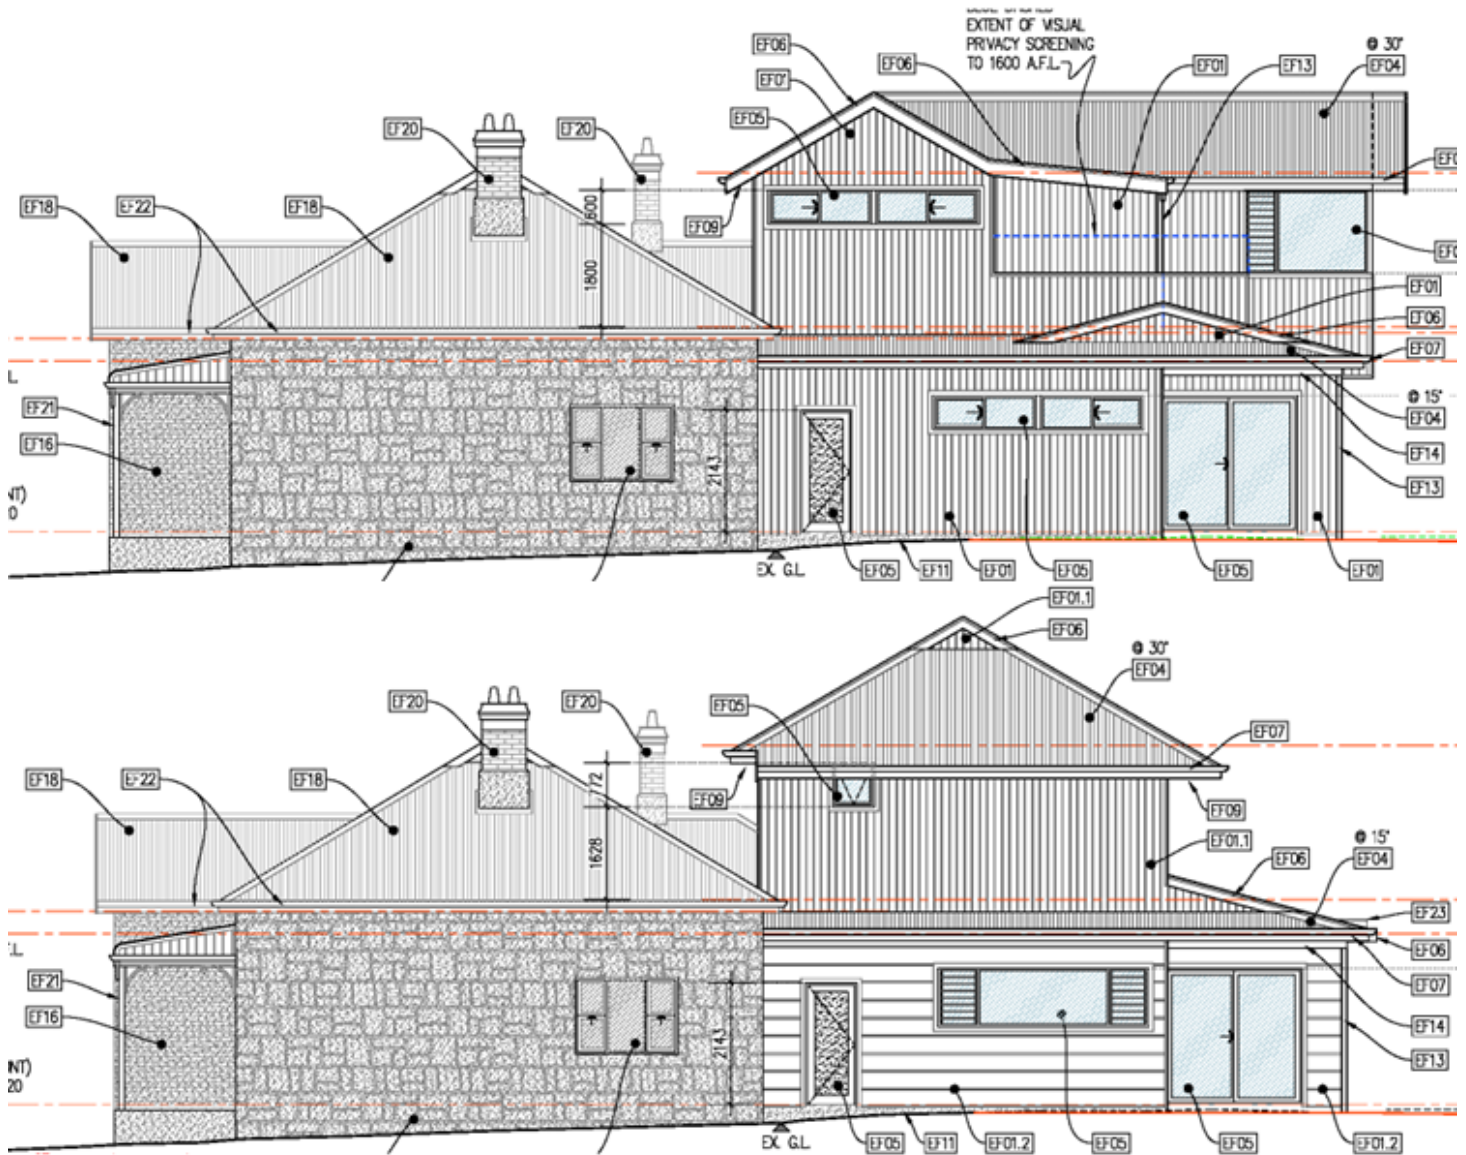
Changes of upper floor of original submitted (left) to amended (right)
